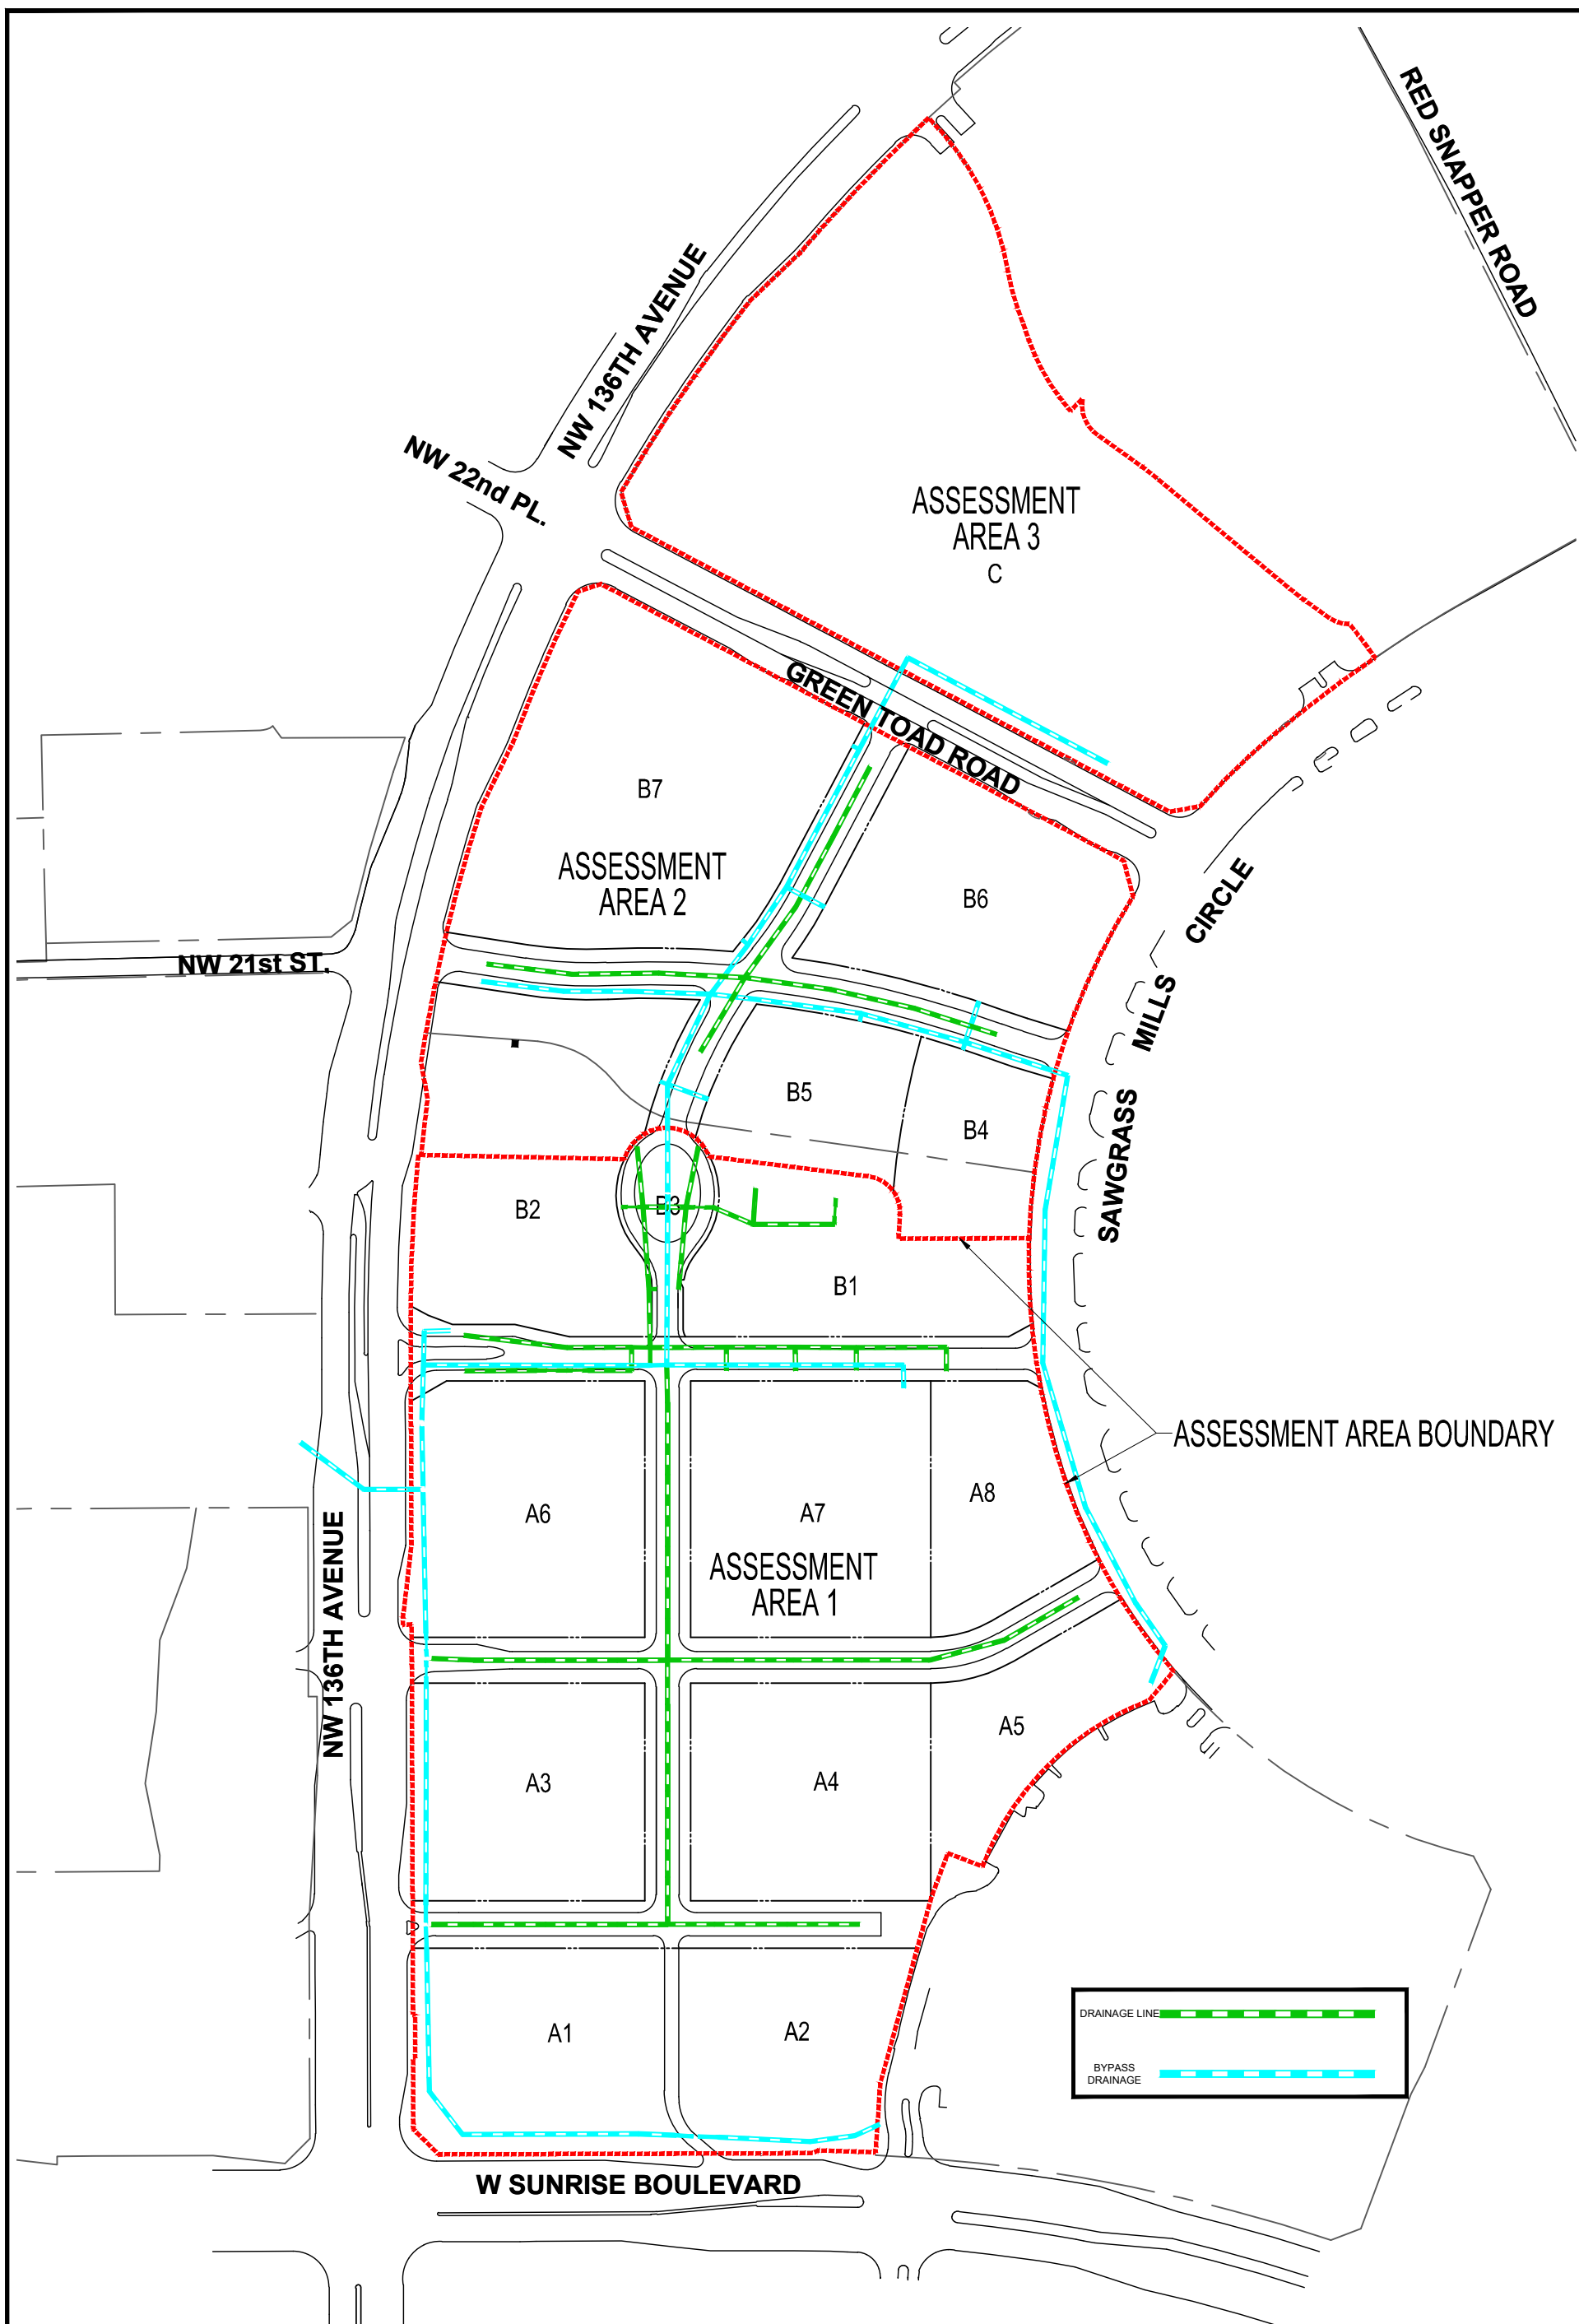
STORMWATER IMPROVEMENTS
